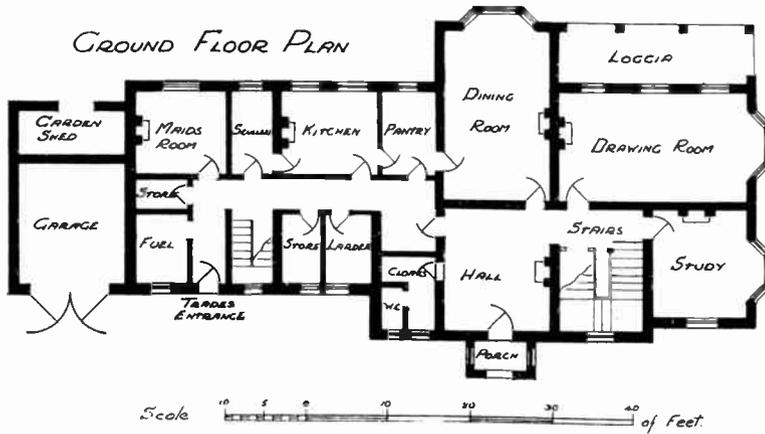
A.—GROUND FLOOR PLAN OF AN IMAGINARY HOUSE.
